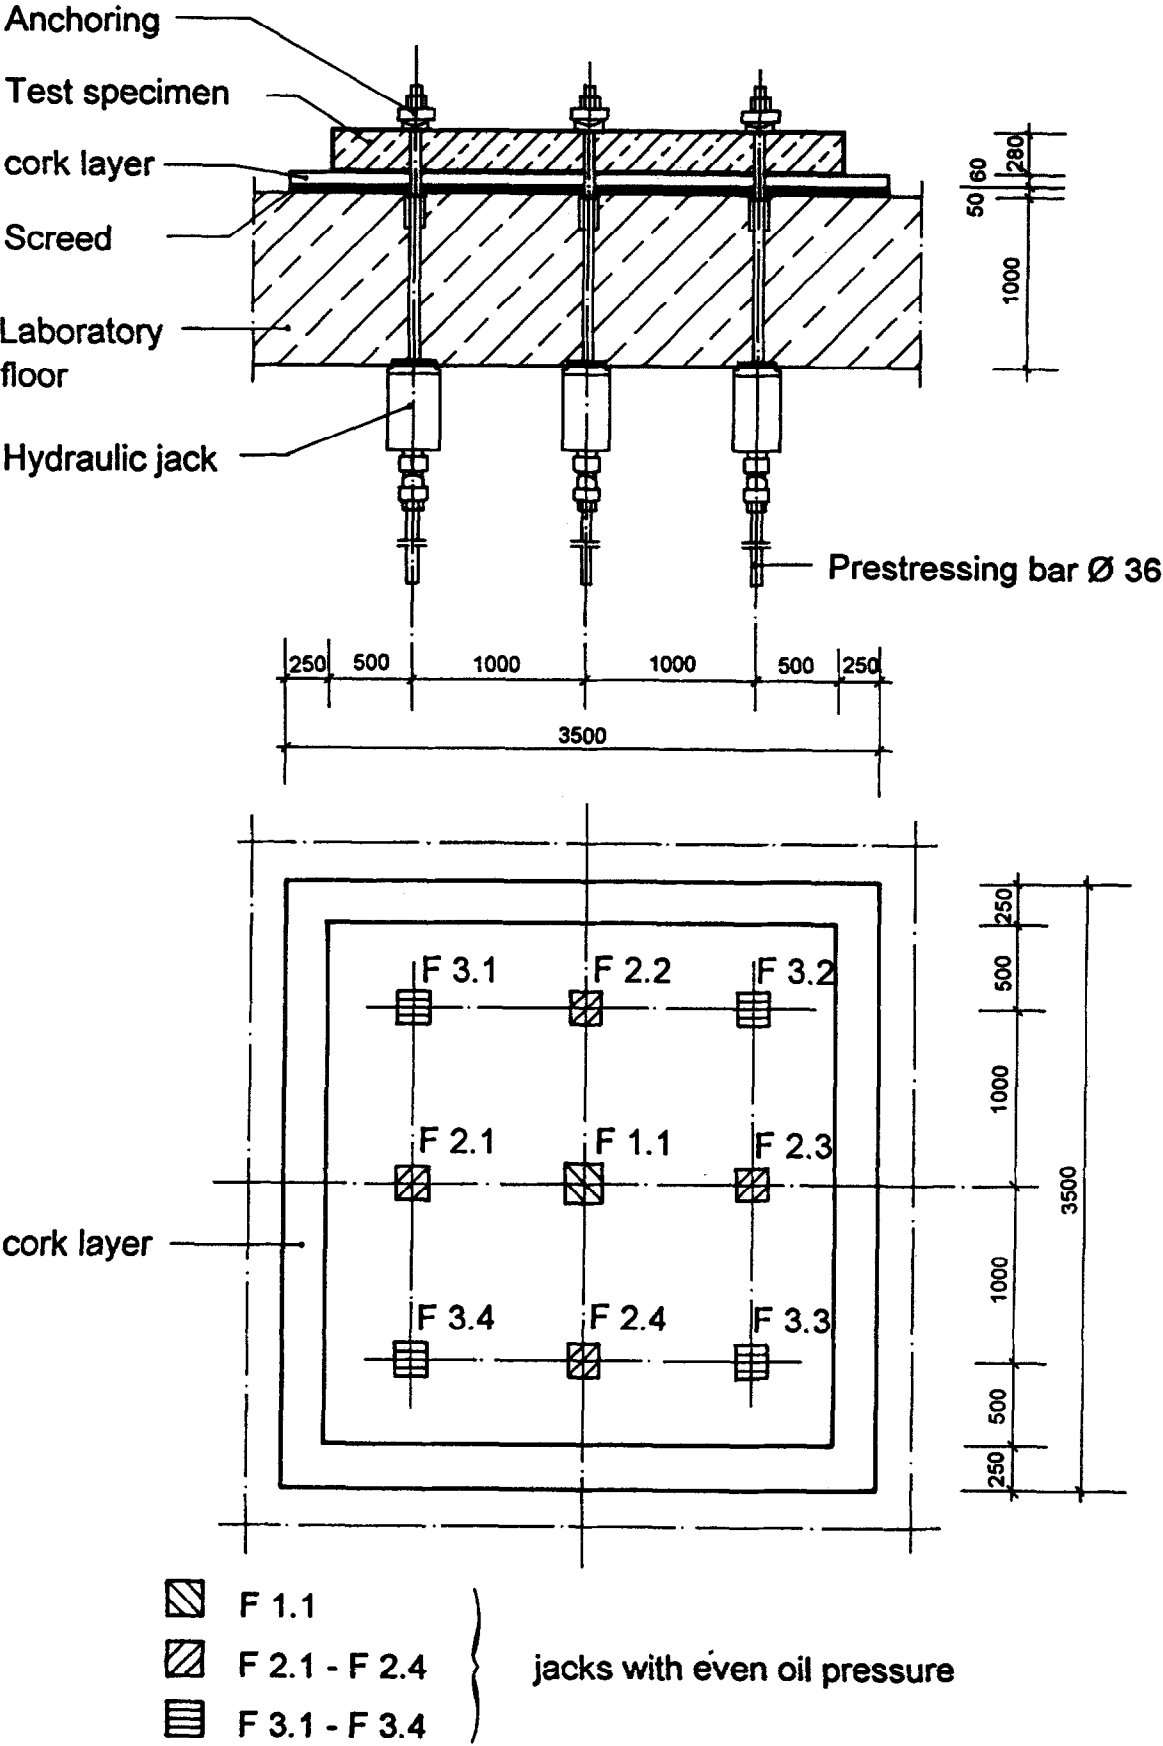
Test set-up for plain and steel fibre reinforced concrete slabs.
